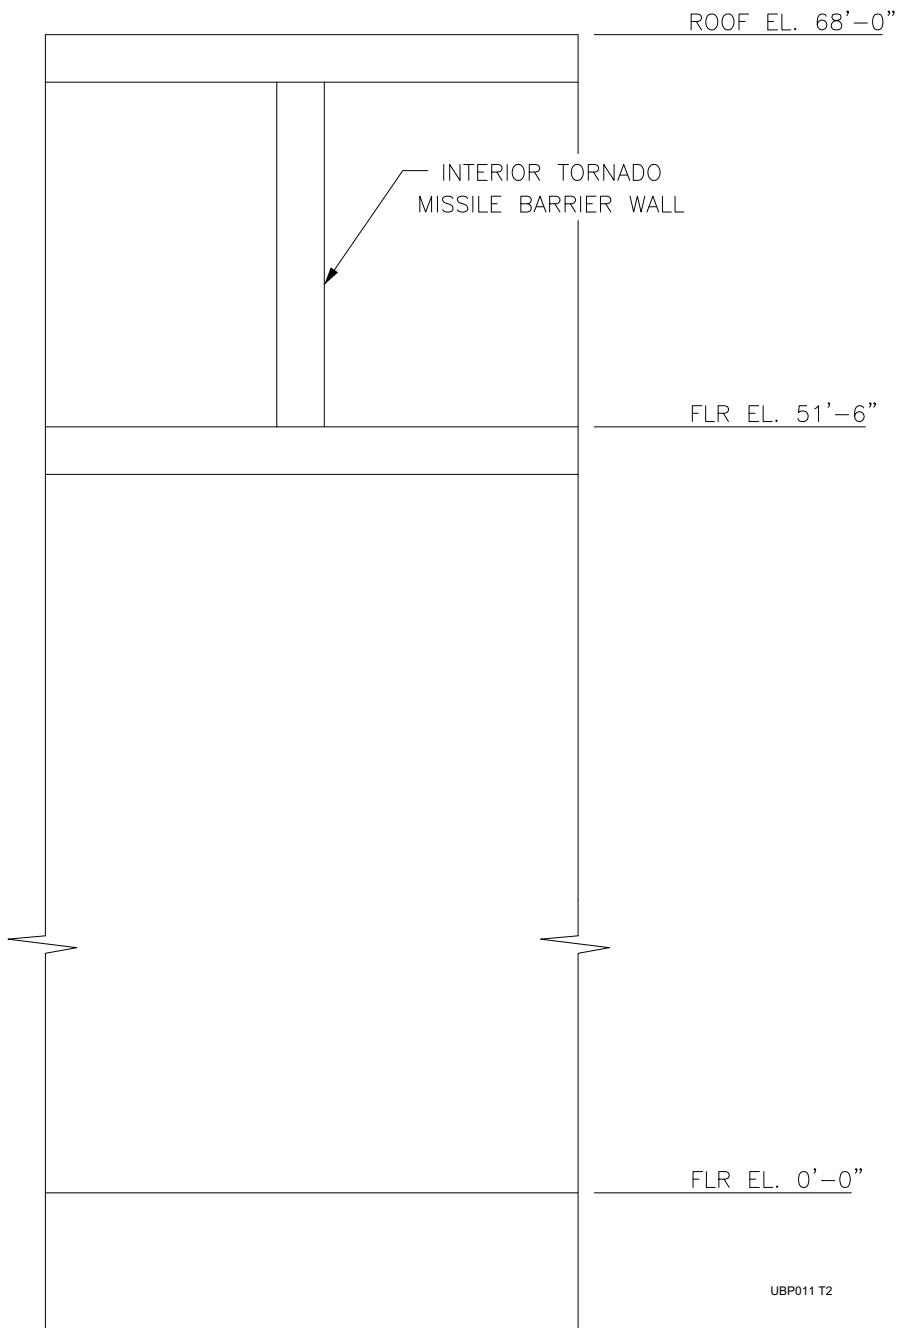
E.2-10—Elevation View of EPGB Critical Section at Elevation 51'-6"
